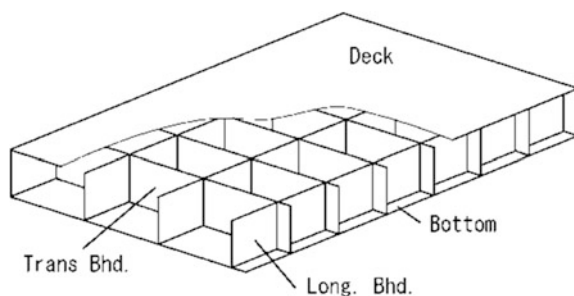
Typical structural arrangement of a Pontoon-type VLFS
